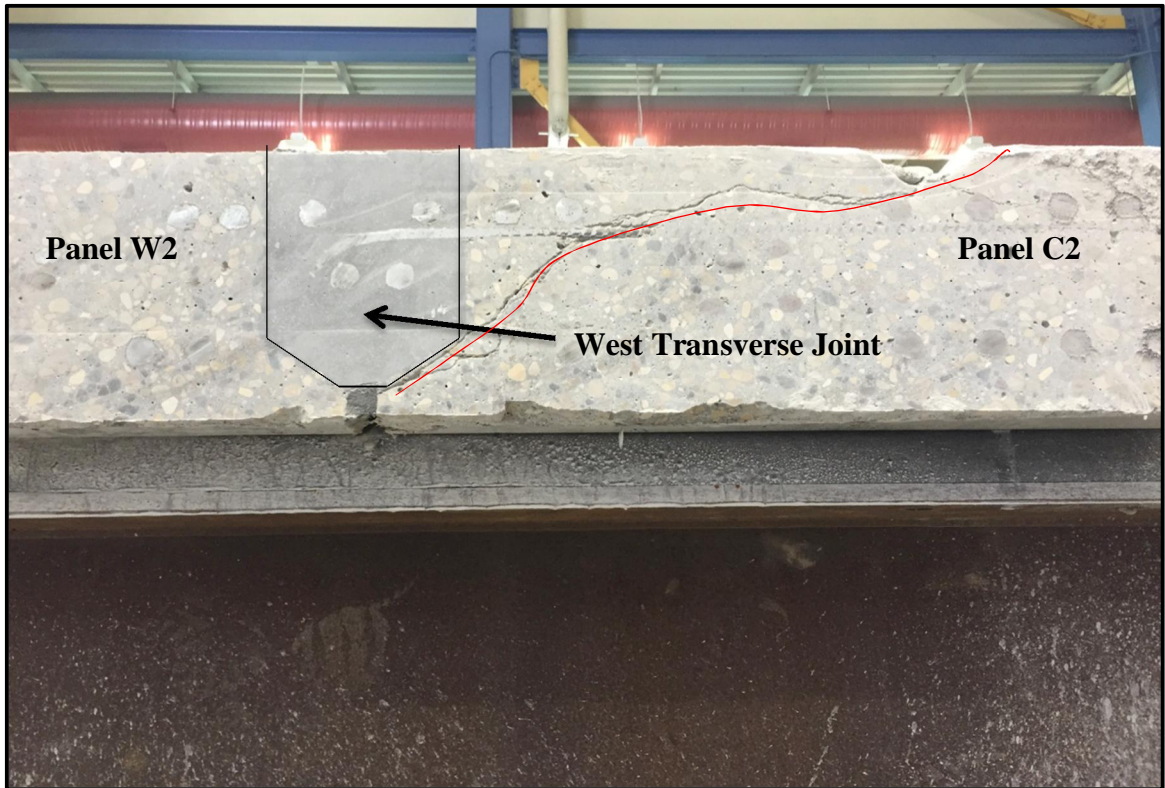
Cracks in Panel C2 Due to Panel W2 Lifting During Failure (Test #3)
